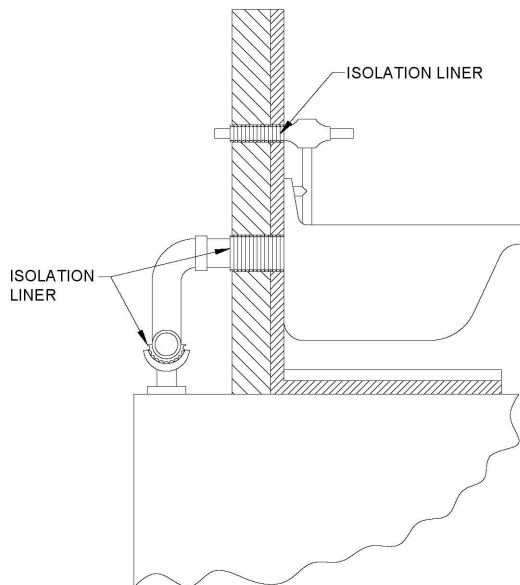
Wall-Mounted Urinal, Sink, or Similar Fixture
